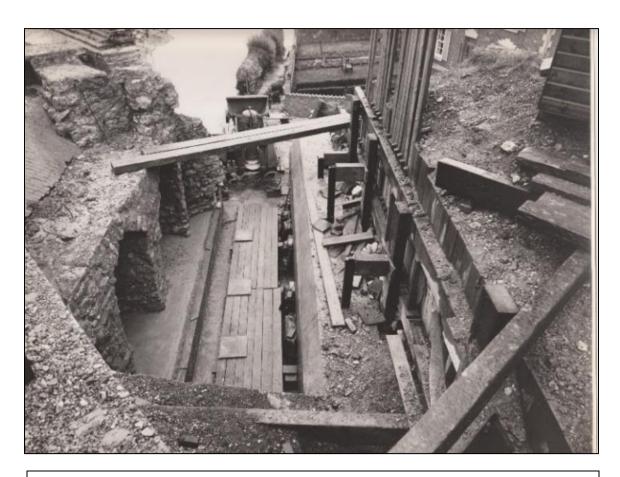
aerial view, looking north, shows stone arches aligned with presumed course of stream in culvert: remnants of stone added above the brick vault, metal ties used to secure it, and stump of angled stone wall across front of the embankment: 1 and 3 Gloucester Road visible on right
